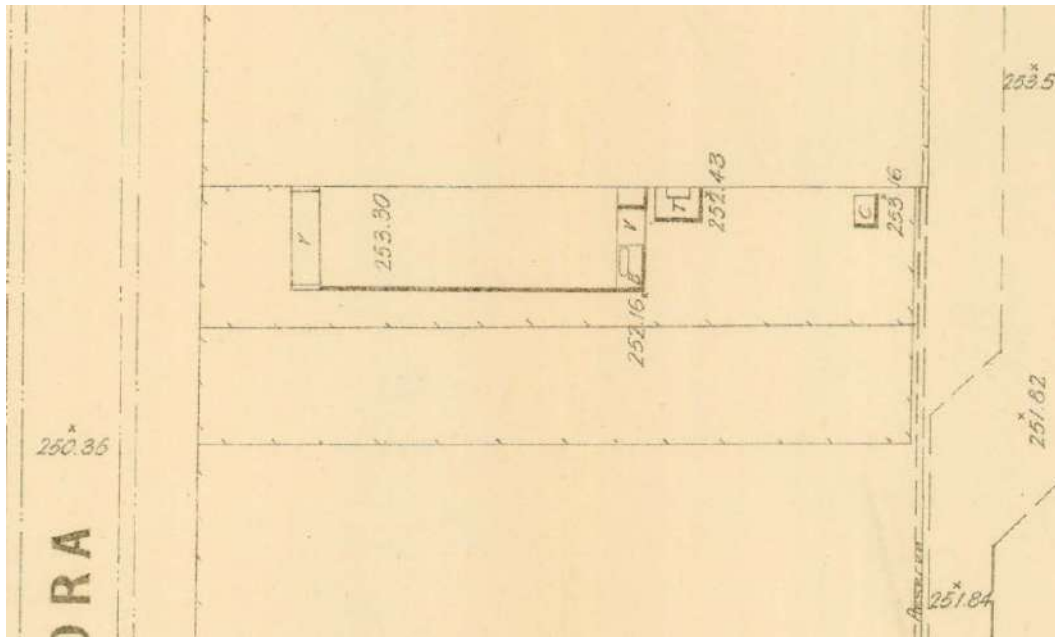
MMBW detail plan no. 1993 dated 1905 showing the original footprint of the house at 6 Alexandra Avenue (Source: SLV).
